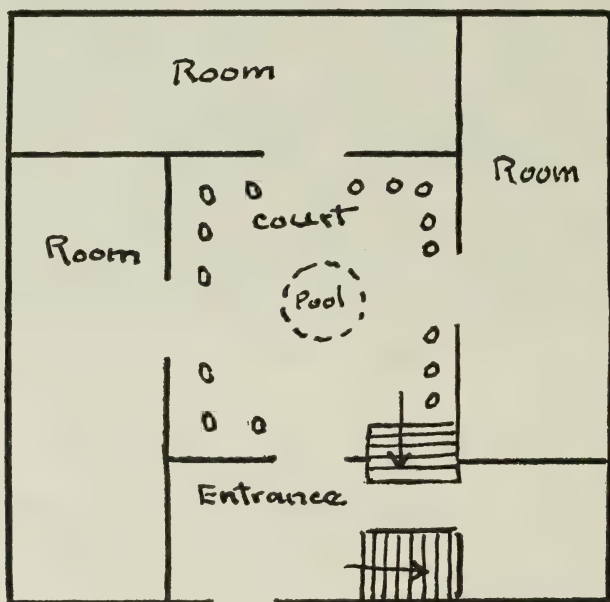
PLAN FOR A HOUSE BUILT AROUND A COURT
